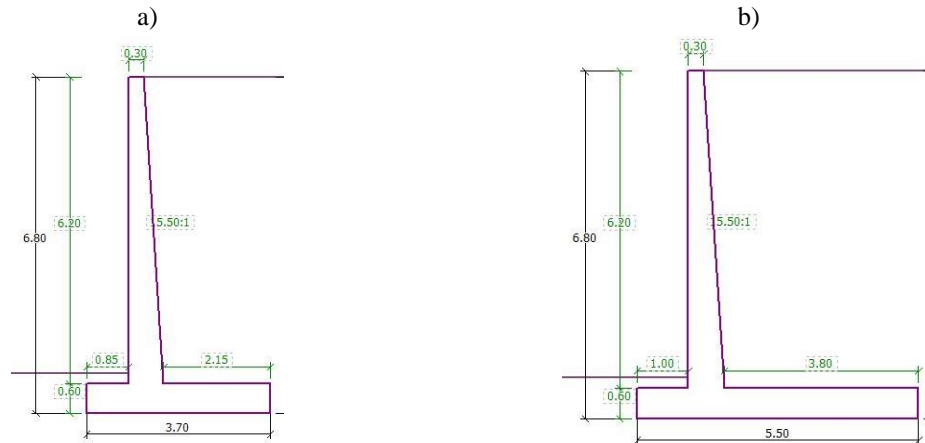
Obtained foundation width for a wall $H=6.0\text{m}$ according to: a) MKS – Zone IX - MCS, b) EC 8-5, $a=0.25g$
